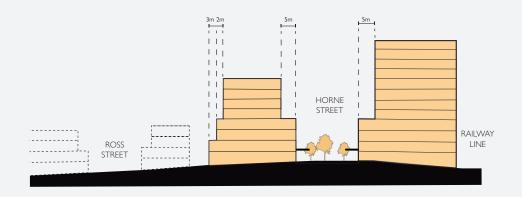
Cross section view of Horne Street and Ross Street looking northwest from Rusden Street.
